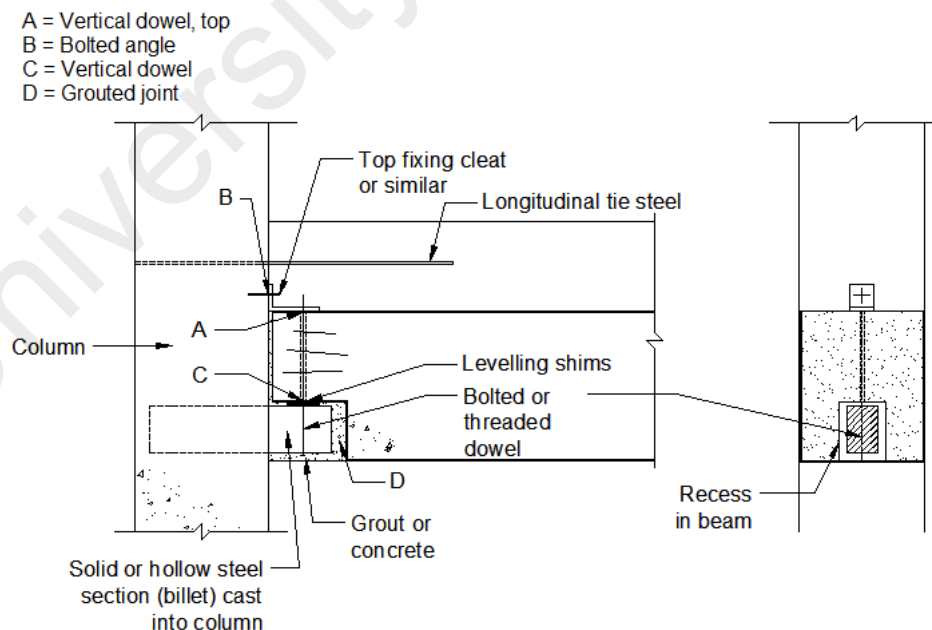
Existing precast beam to column connection (Fib, 2008)
